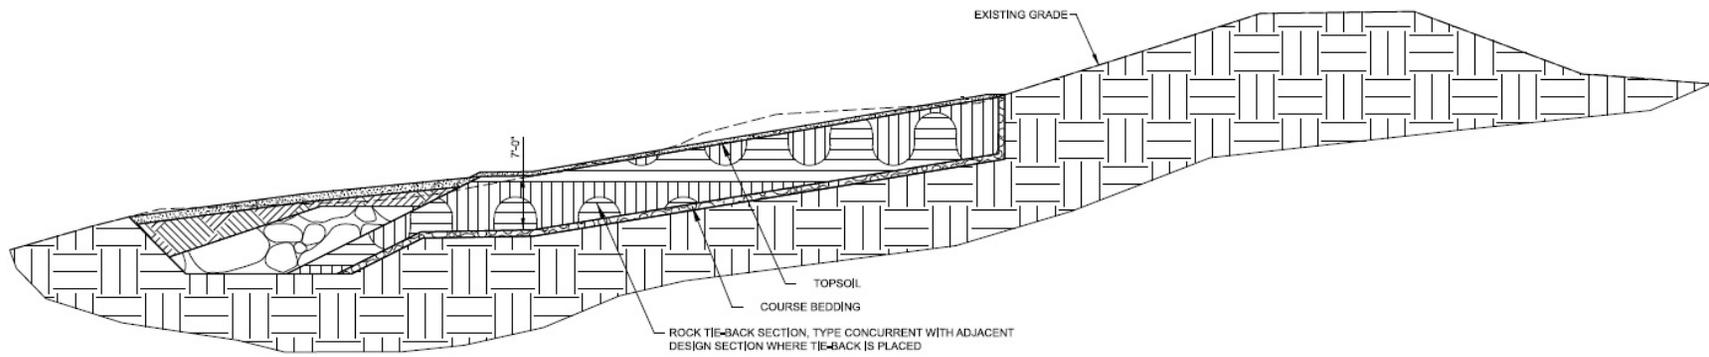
Example cross section (cut parallel to river) of planting bench tie backs found at American River Erosion Contract 3B North and South
